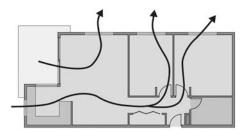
effective layout for an upper level corner dwelling/apartment.
